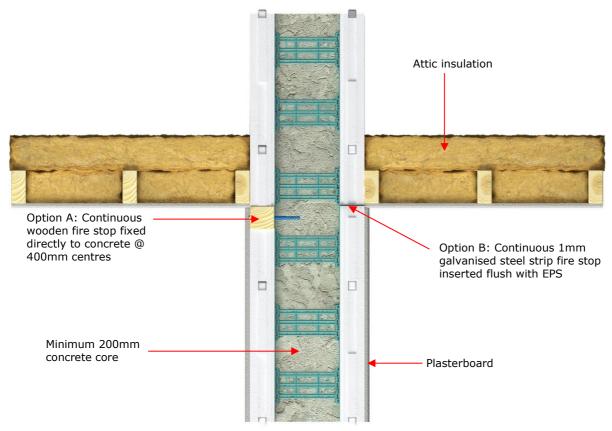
Sectional Elevation of Party Wall at Attic Floor Showing Fire Stop Options
